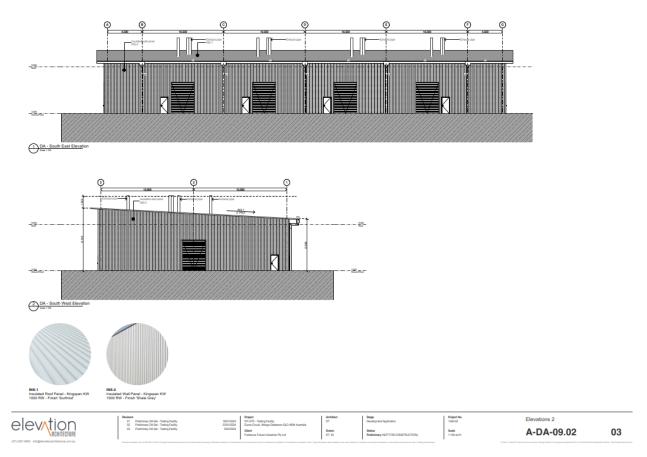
Building Elevations 2 (Source: With Architecture Studio)
